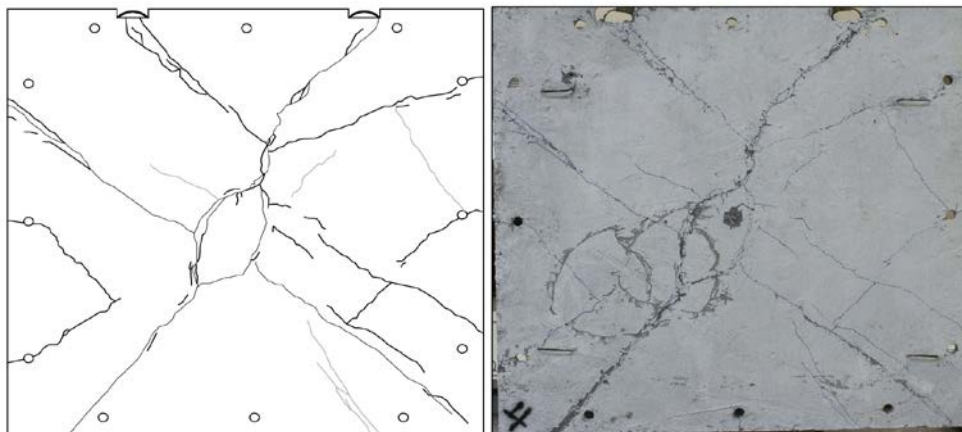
Front Face Crack Patterns After Testing for Panel JA2-125
